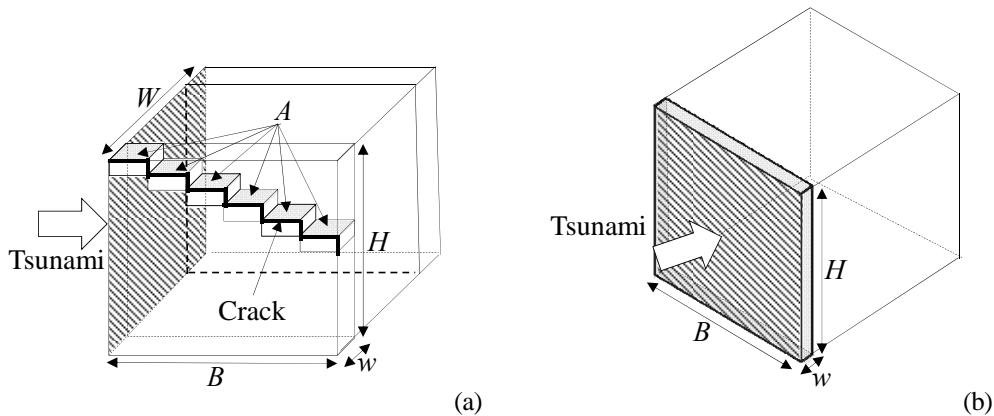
Relation between Direction of a Tsunami Wave and Longitudinal Axis of Subject Wall: (a) Paired Walls placed at Right Angles to a Coastline, and (b) Wall out of Placed along a Coastline
